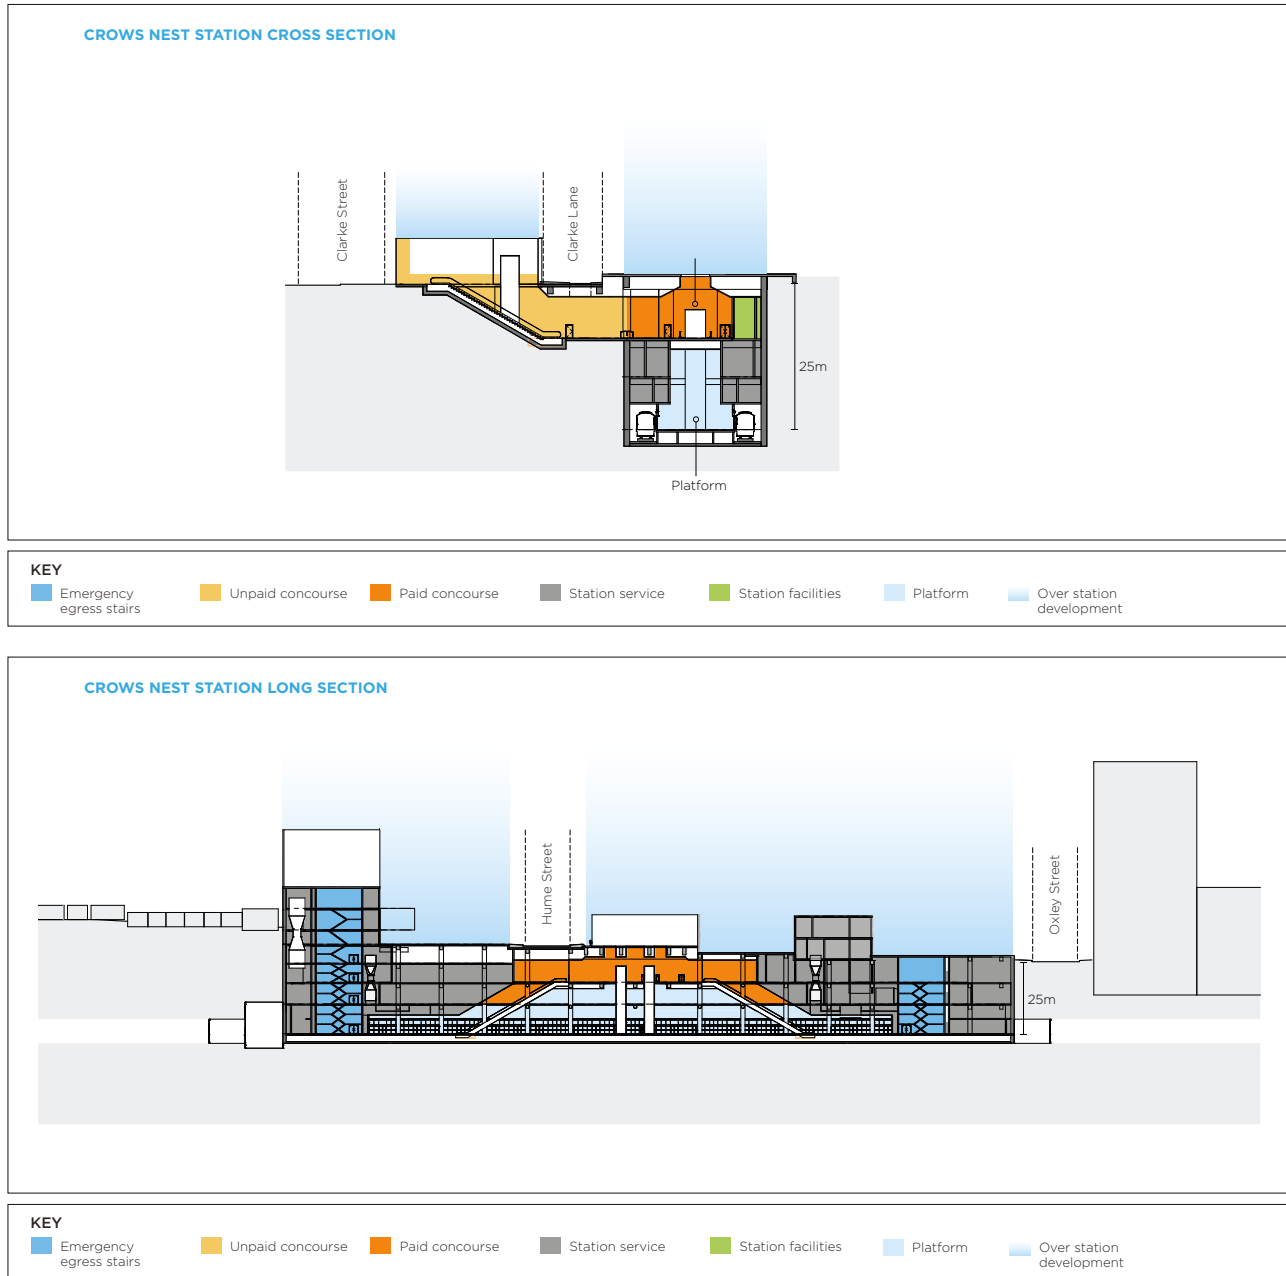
Crows Nest Station – indicative cross-section and long section
